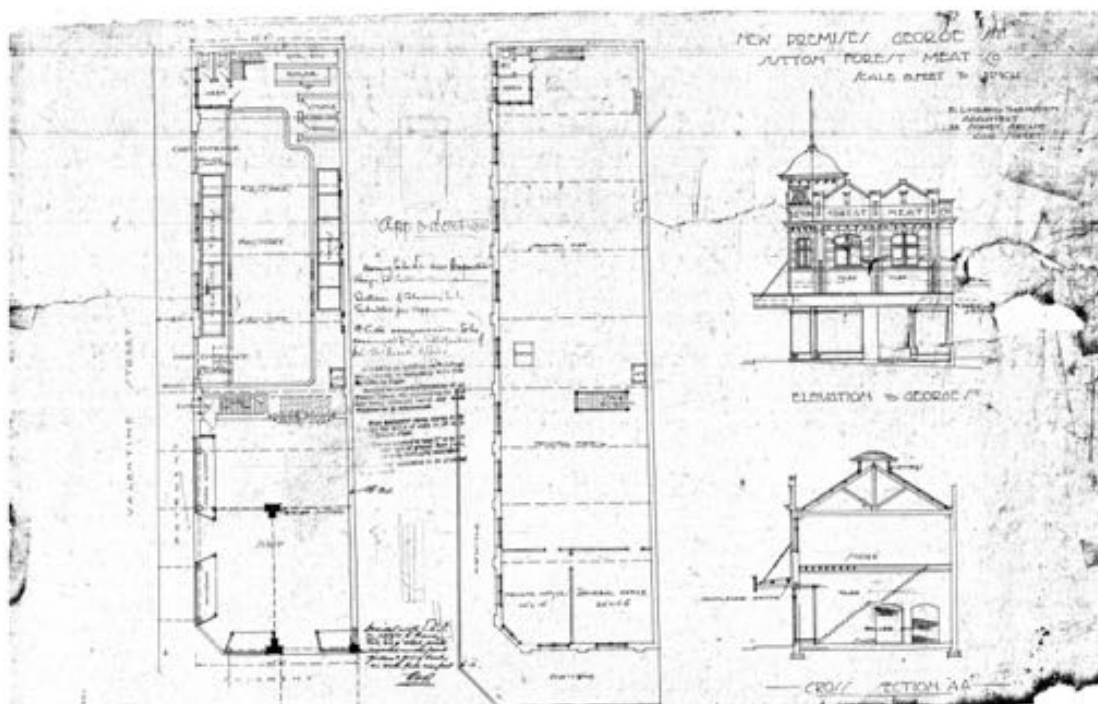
Original architectural design drawings for Sutton Forest Meat Co building by E. Lindsay Thompson architect, 1910. (Source: Sydney City Archives, Building Application plans 0221/10)
